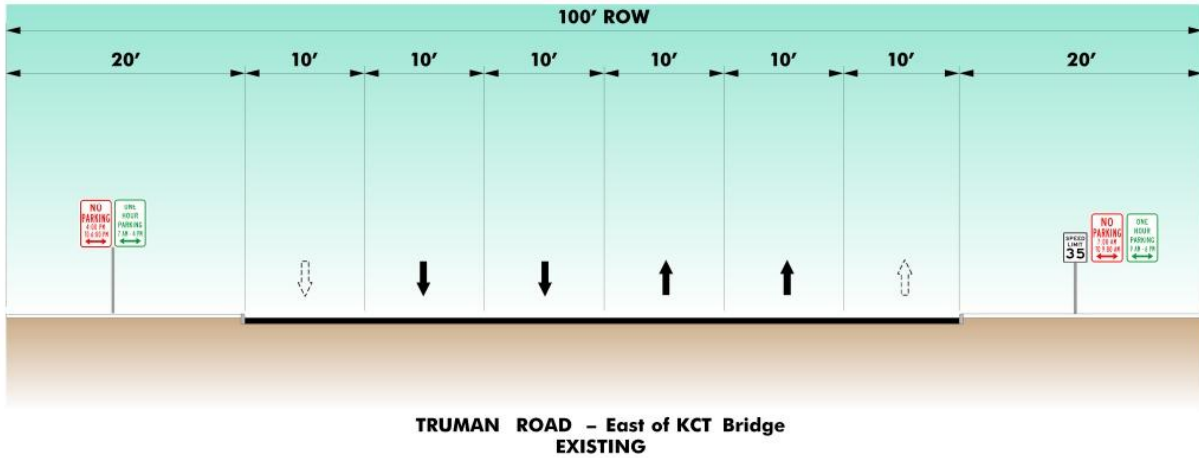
Regional Rail Typical Section on Truman Road – East of KCT Bridge Existing Conditions
